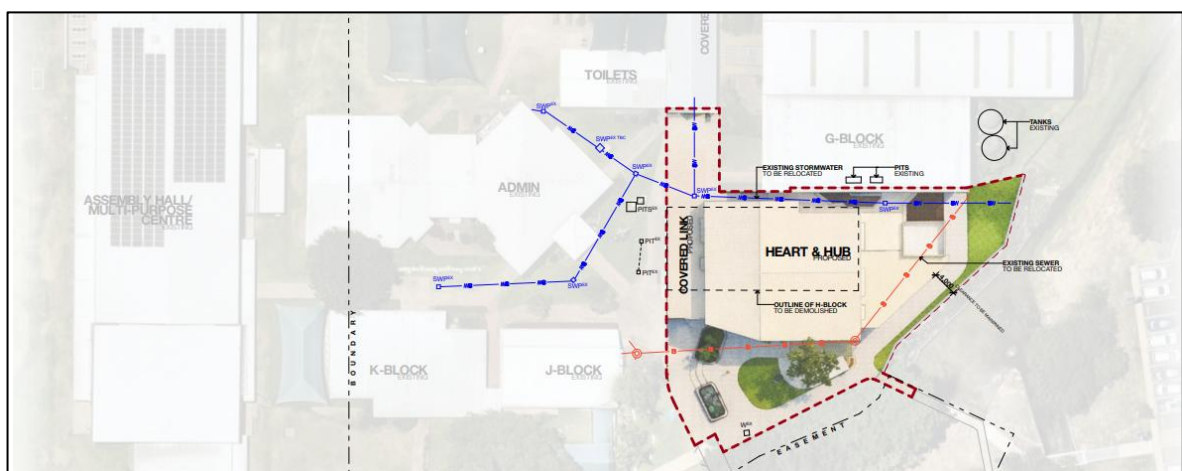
Proposed Development Layout Plan (Source: Burling Brown)
